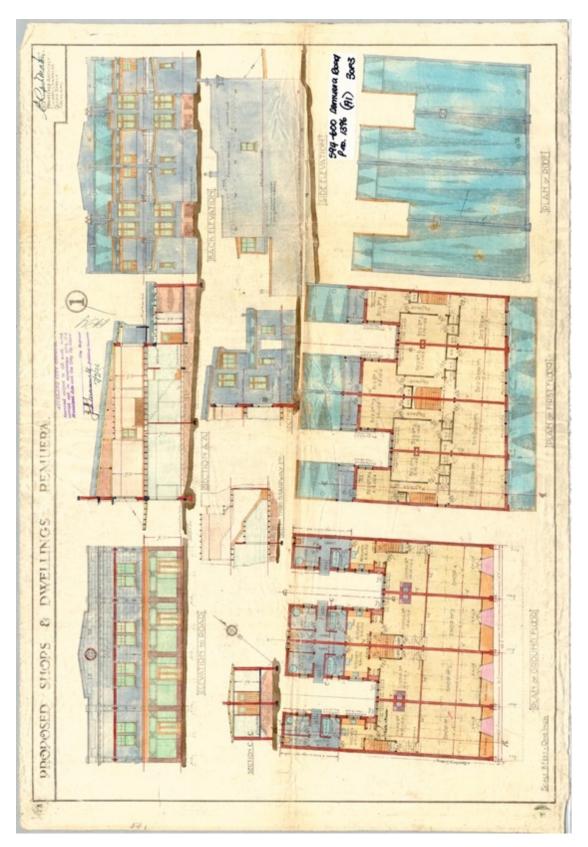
Architectural drawings for four shops and dwellings undertaken by architect, E. Rupert Morton, dated 1926 (AKC 305 Building Permits 1900-1998, 594-600 Remuera Road, Record ID: 391060, Auckland Council Archives).
